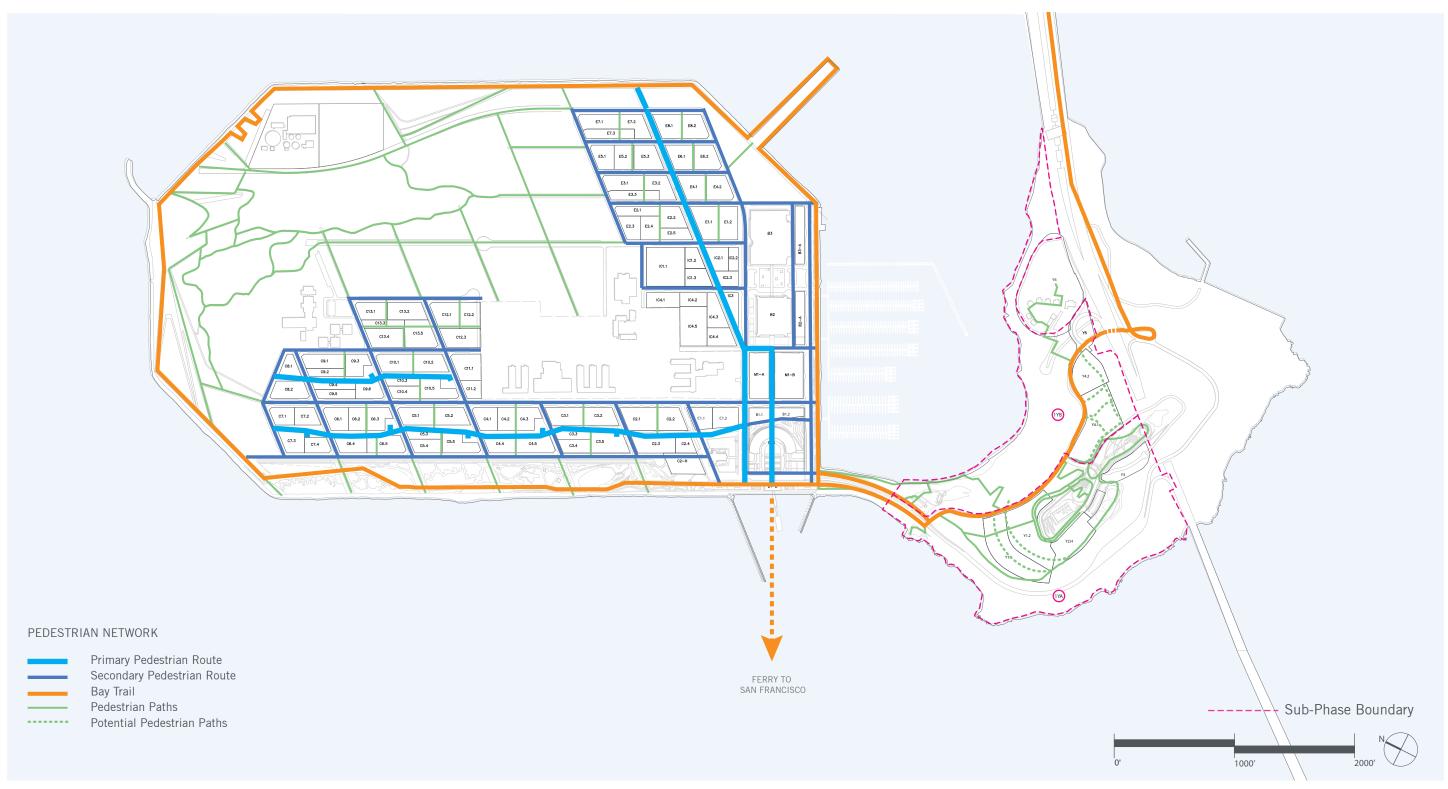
PEDESTRIAN NETWORK SITE PLAN
